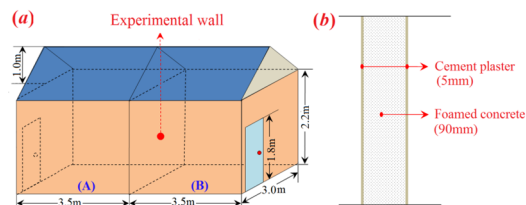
(a) Experimental building and wall and (b) the experimental wall section
